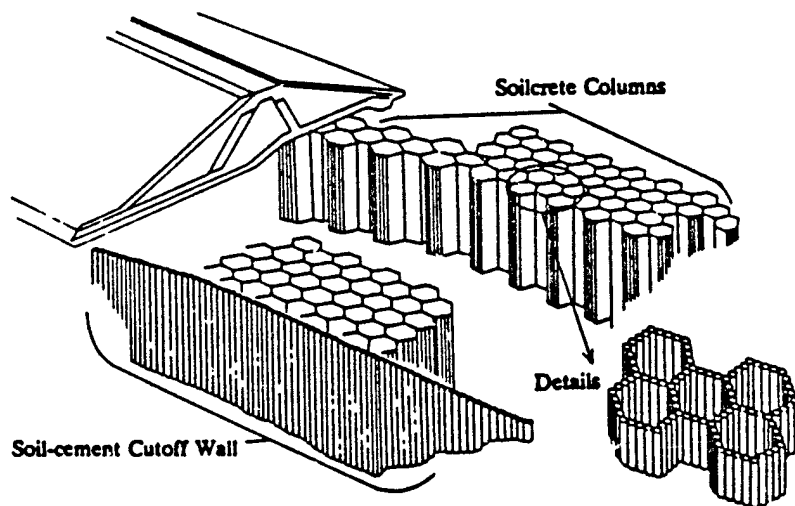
Soil-cement mixing work for Jackson Lake Dam modification project (Taki and Yang 1991).
